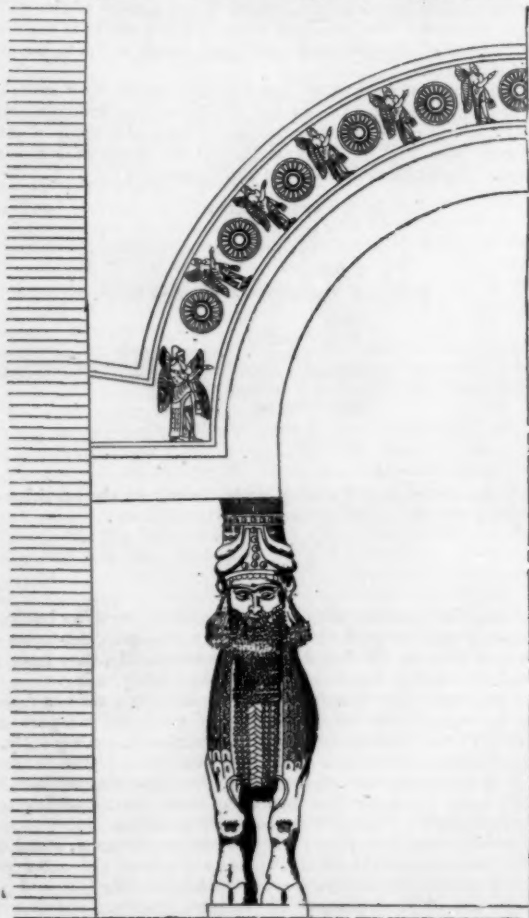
Door in the Southeast Façade at Khorsabad (8th Century B. C.).
